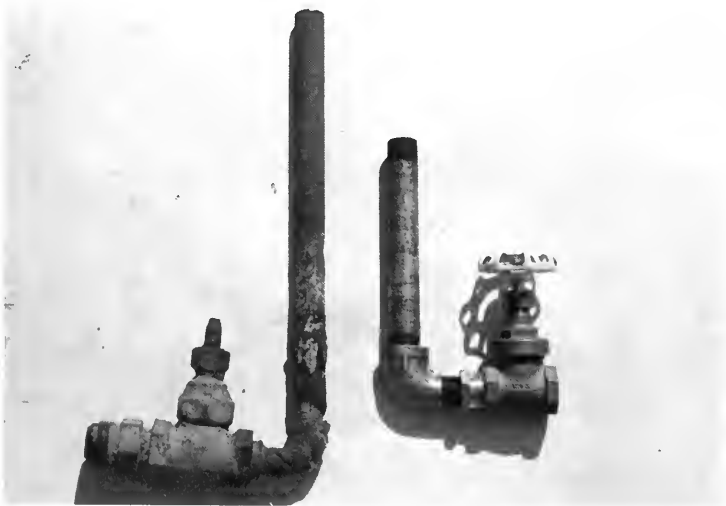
Example of Galvanic Corrosion. See galvanized reducing streetell corroded by contact to bronze valve body.
